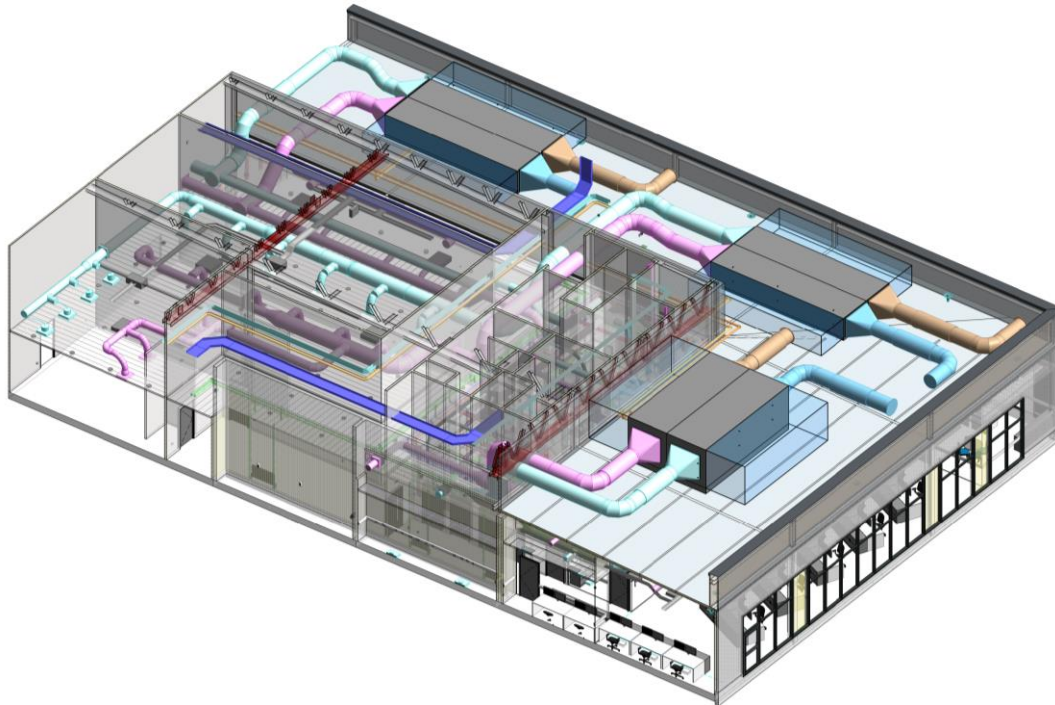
Proposed roof plant above Office Area (North Eastern Corner) – Phase 1 (AHU units) (3/3)
